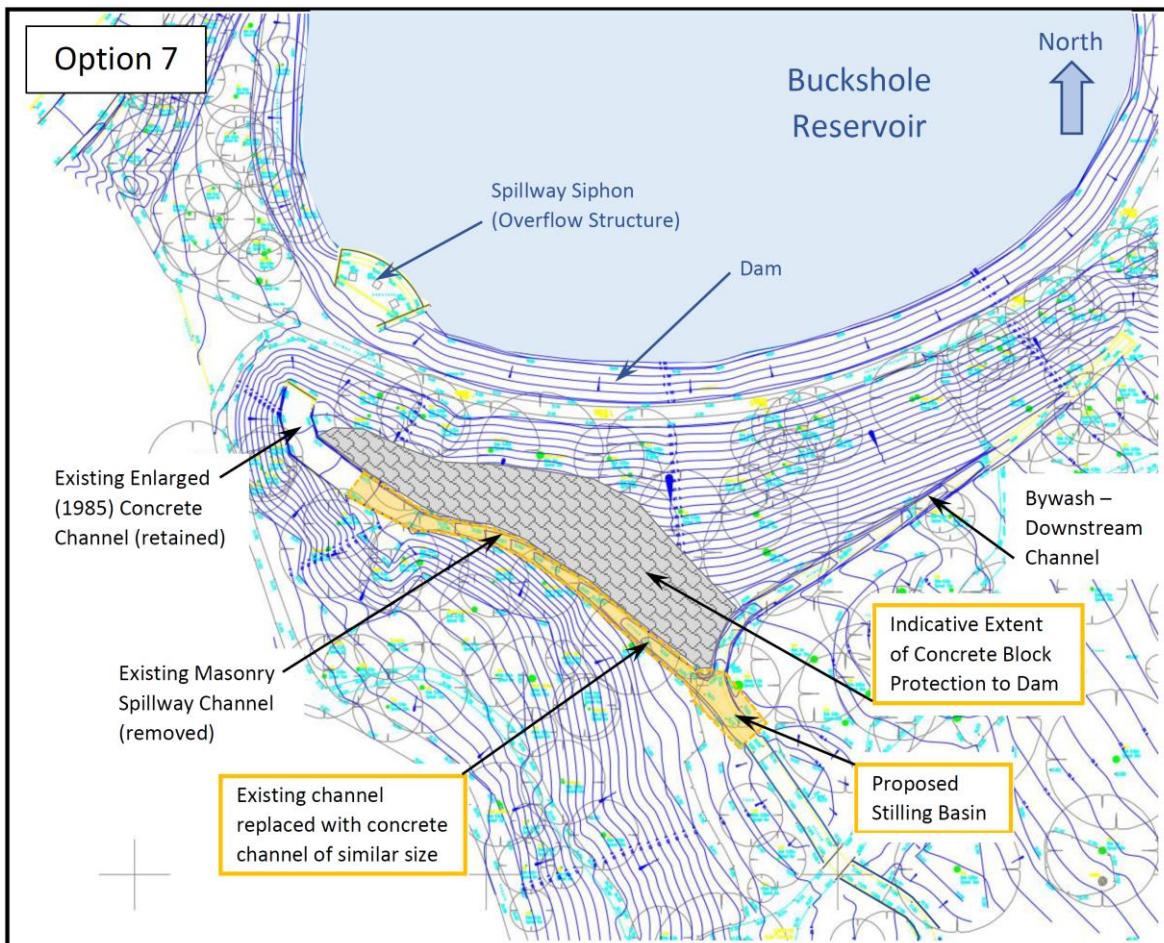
Option 7 Proposed New Spillway Channel and Concrete Block Protection to Dam
